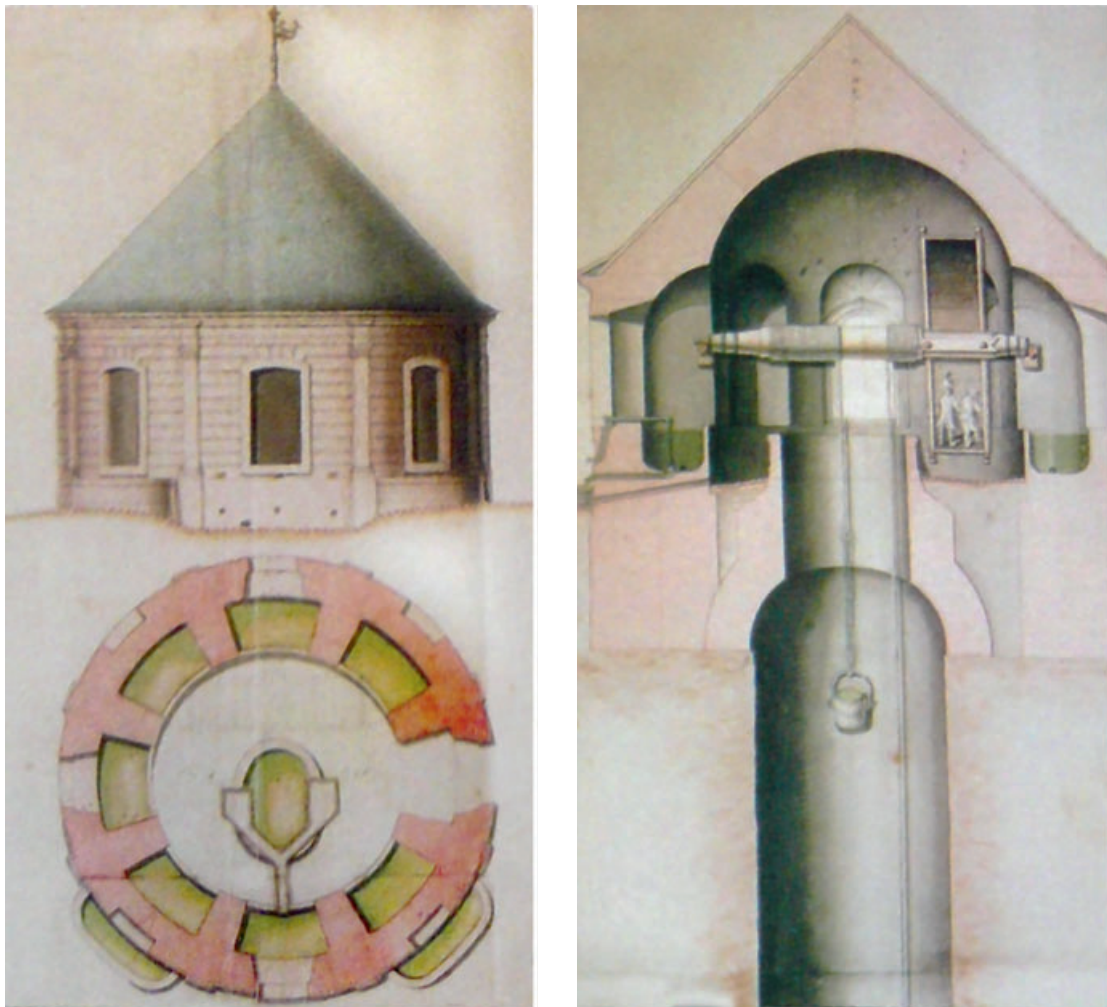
Vauban's Siege Well (*Puits de Siège*) in the *Place d'Armes* at Longwy – plan, external elevation and cross-section (<http://www.mairie-herserange.fr/mes-loisirs/culture/office-de-tourisme-du-pays-de-longwy/>)
